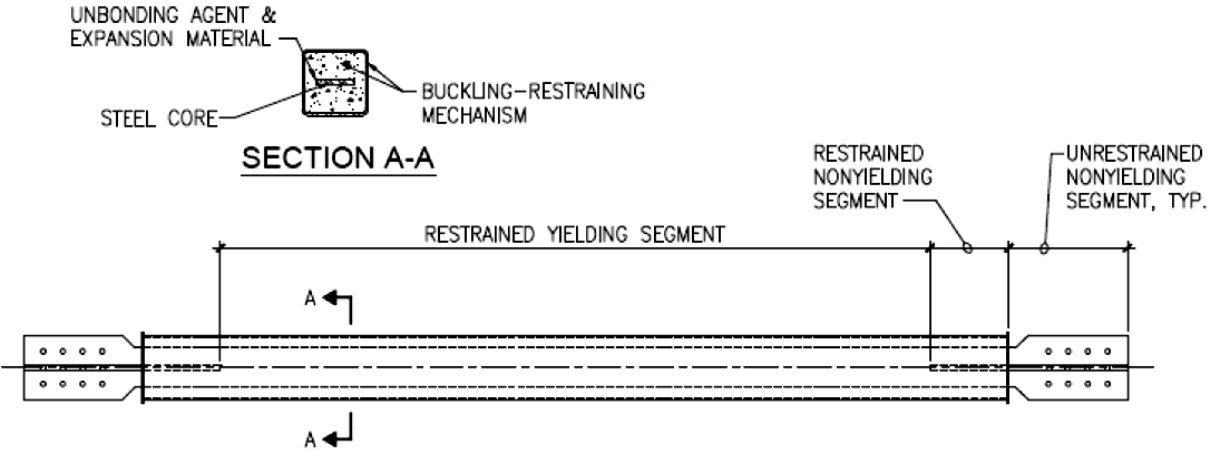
Typical steel-concrete BRB cross-section with elements (Fussell 2010)
